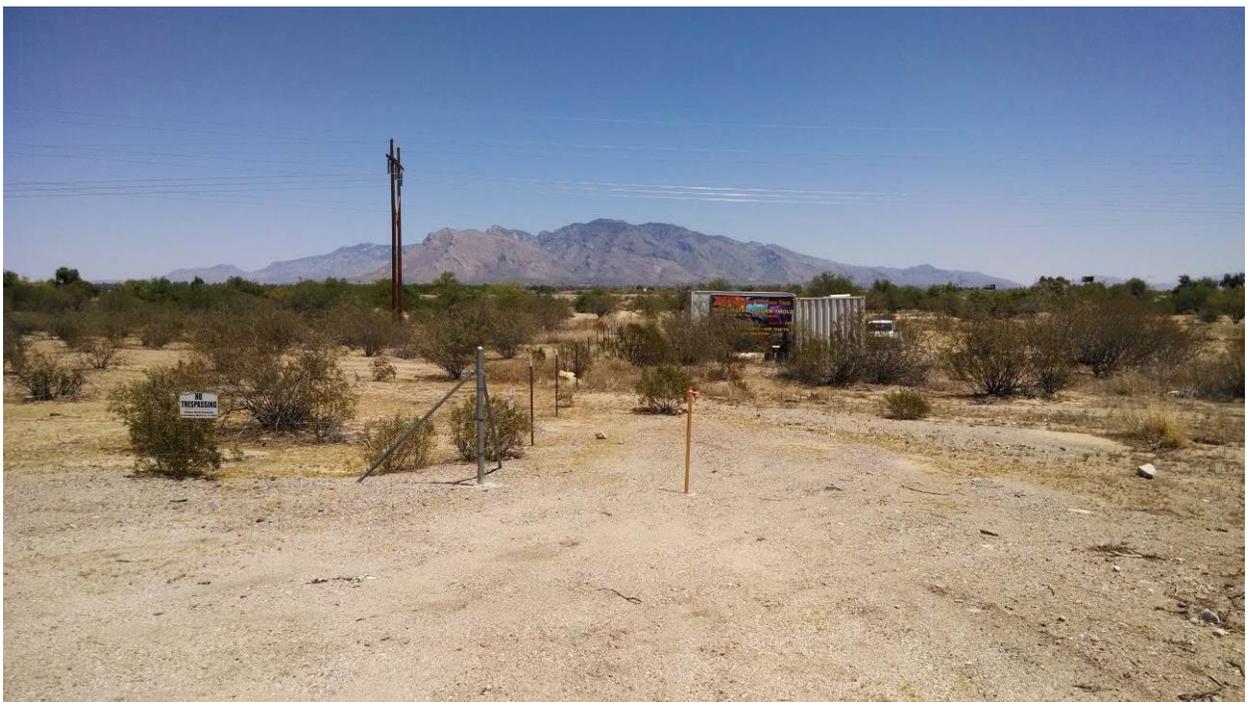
View along the Sunset Road proposed alignment at Silverbell Road, facing east.
